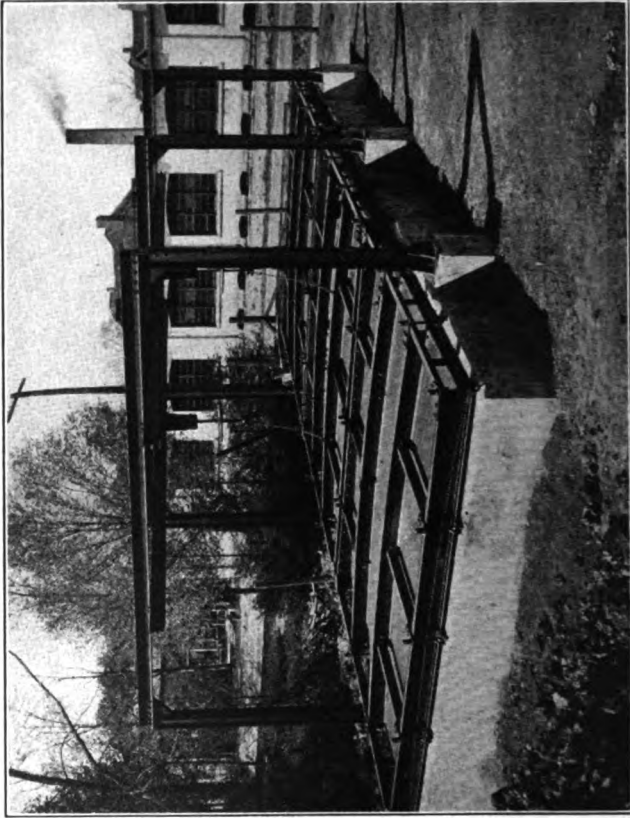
(No. 11-b) Typical installation of concrete boxes for small plant.
